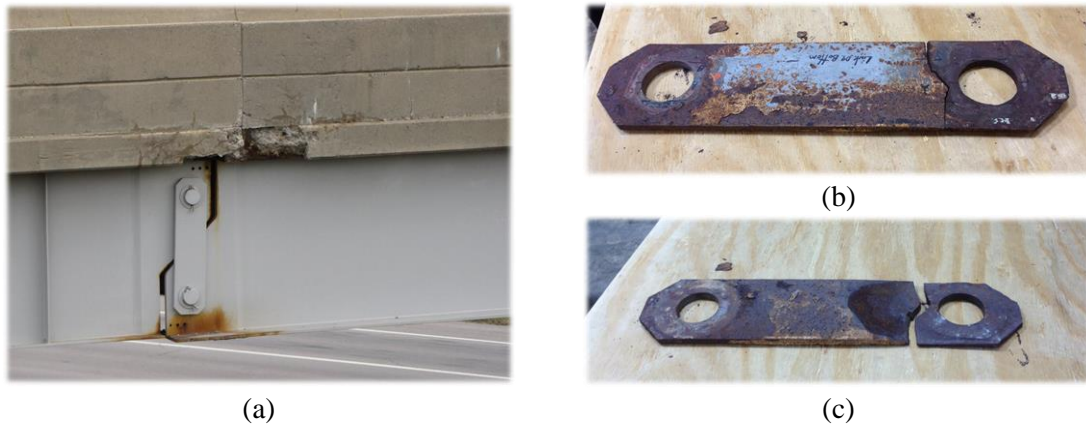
Pin and hanger detail (a) shown in-service suspending middle span girder from end span girder and shown removed due to extensive corrosion damage to the (b) outside (c) inside face
